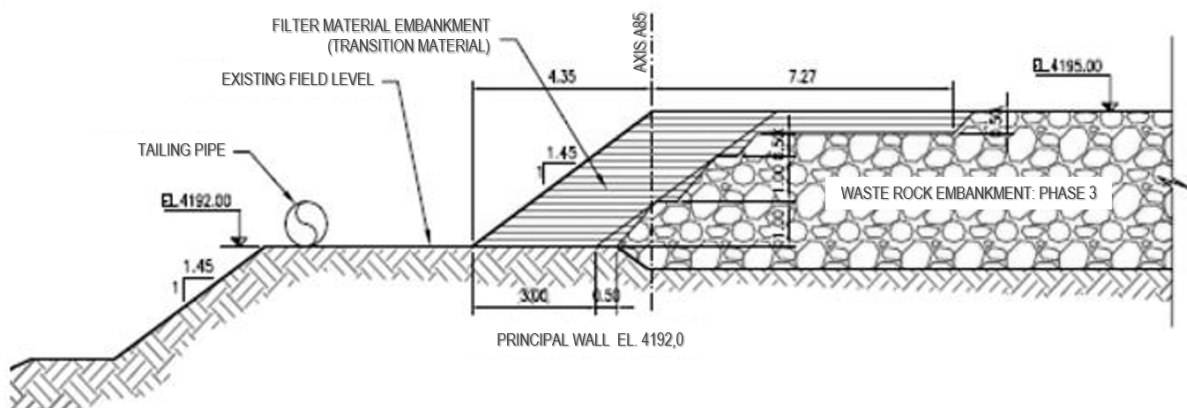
Pampa Pabellon tailings dam typical interface layer section
